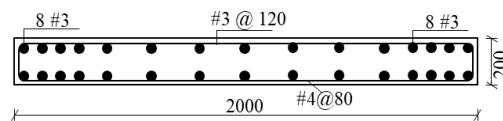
SW-1 Shear wall FEAViewer configuration
